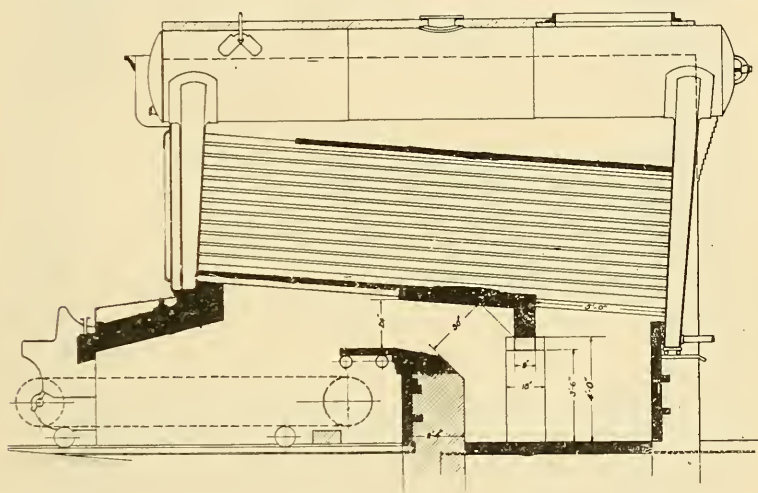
Furnace Reconstruction at United Railways Co. Central Power House.
